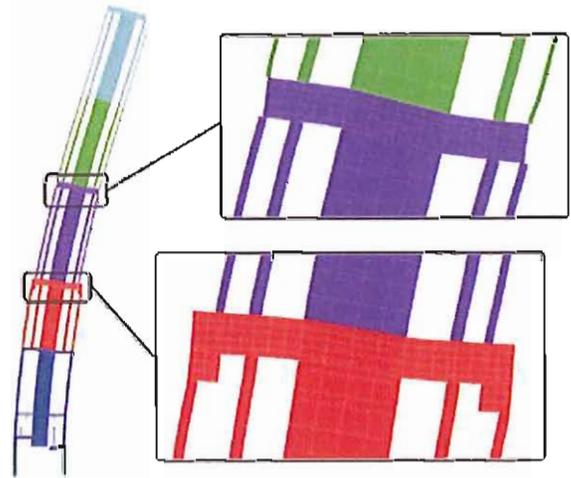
The outrigger wall-beams engage perimeter columns to significantly increase the effective width of the lateral system
